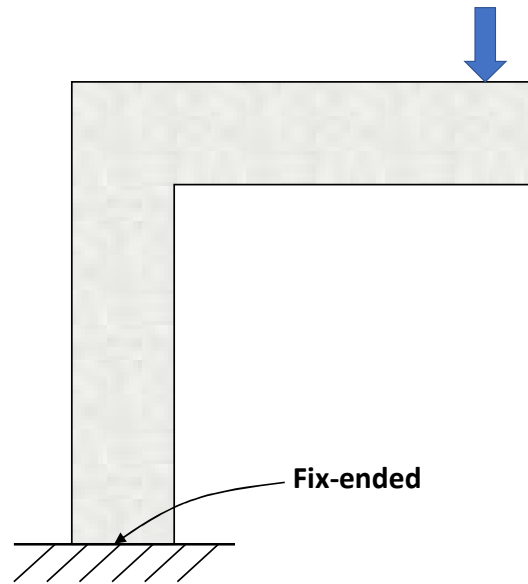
Schematic of test setup for cantilever beam and knee joint
